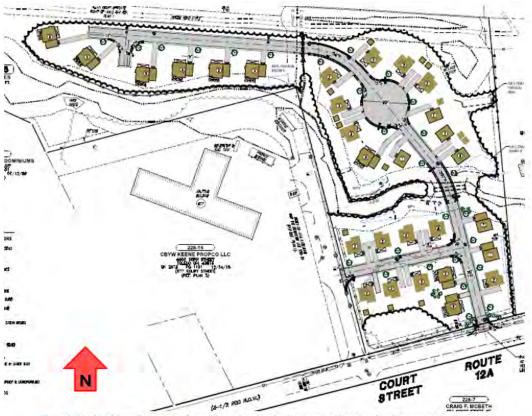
, A snippet from the proposed conditions plan showing the layout of the 29-unit cottage court development.
